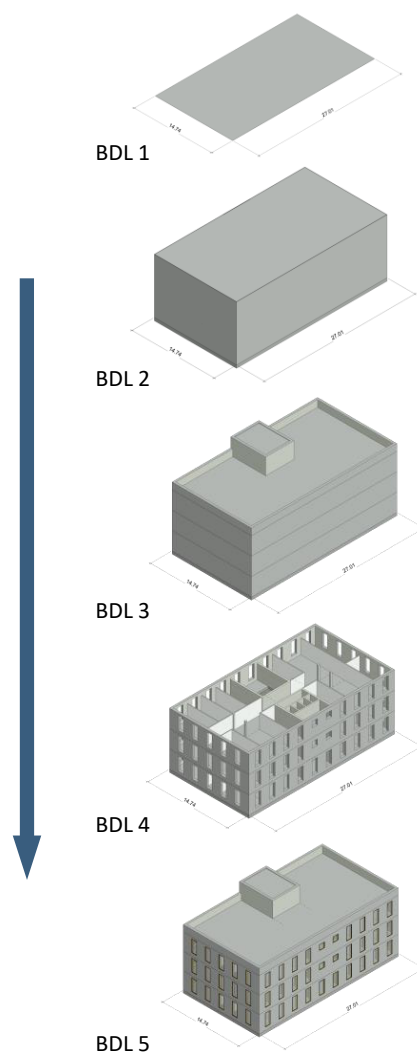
Refinement of building model at early design stages using the proposed Building Development Level (BDL) scale
